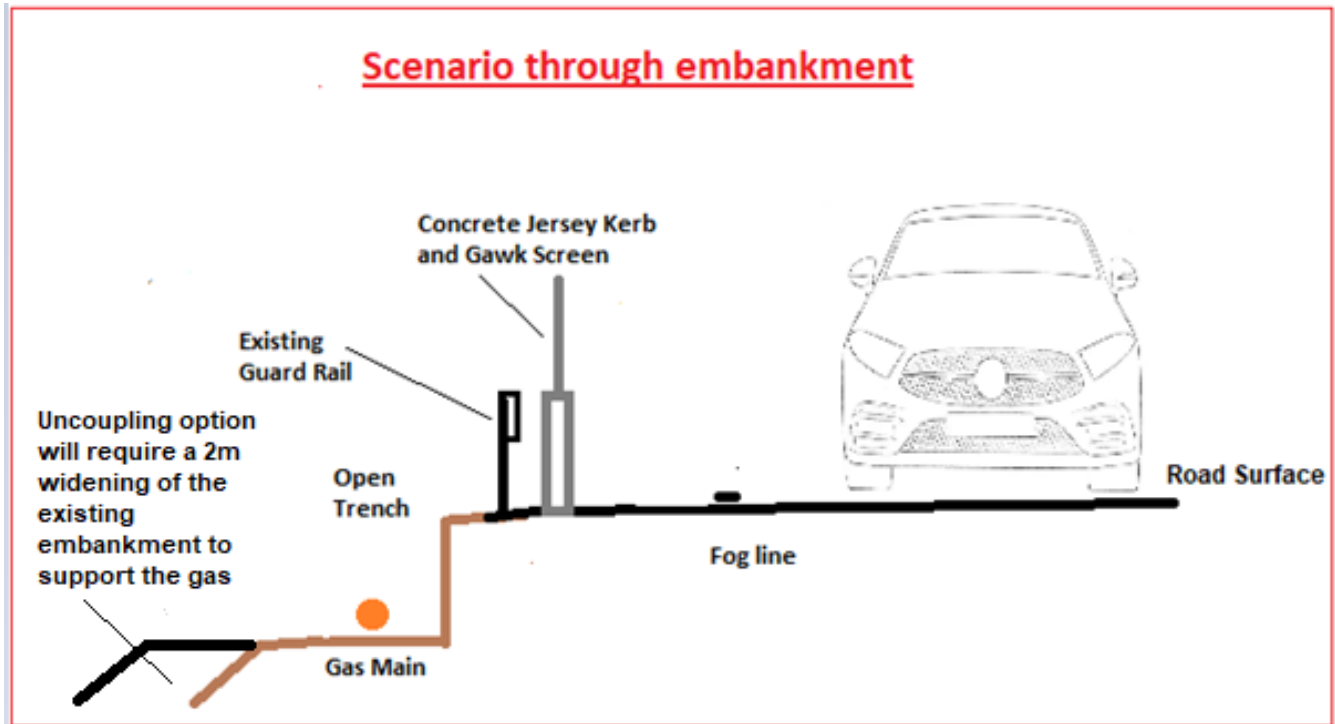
Typical Scenario for pipe through embankment (showing widening if Option 1 is not approved)
